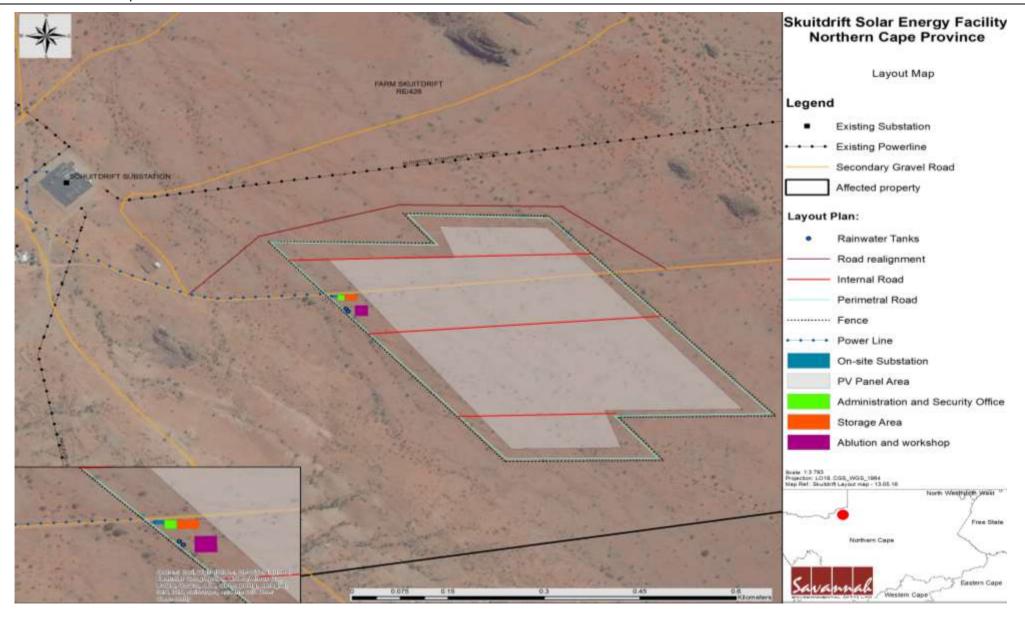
Layout map indicating the proposed Skuitdrift PV Facility and the 33kV distribution power line route to be constructed as well as the preferred access road re-alignment
